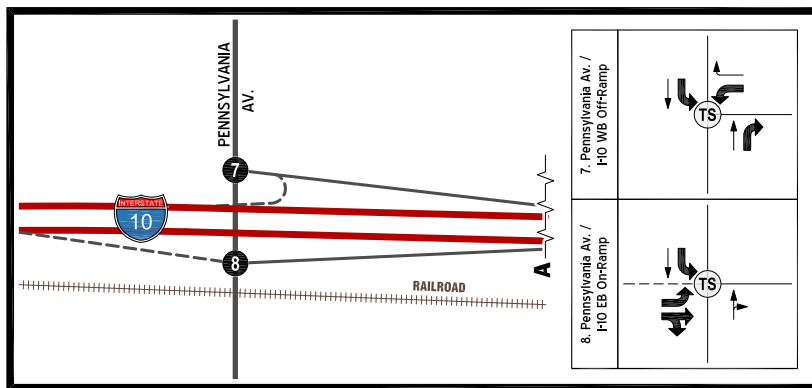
ALTERNATIVE 2 (HOOK RAMPS) INTERSECTION TRAFFIC CONTROLS AND APPROACH LANES
